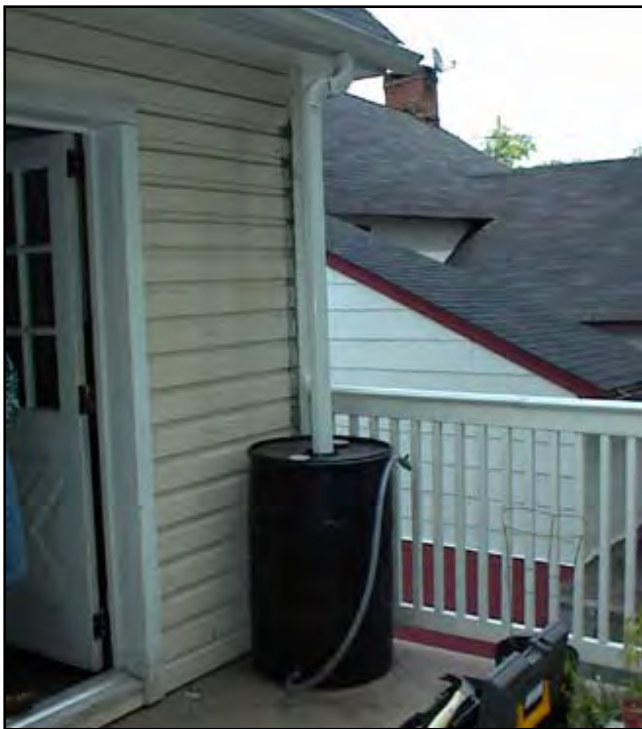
Rain barrel installed on a balcony due to space constraints on a small lot.
